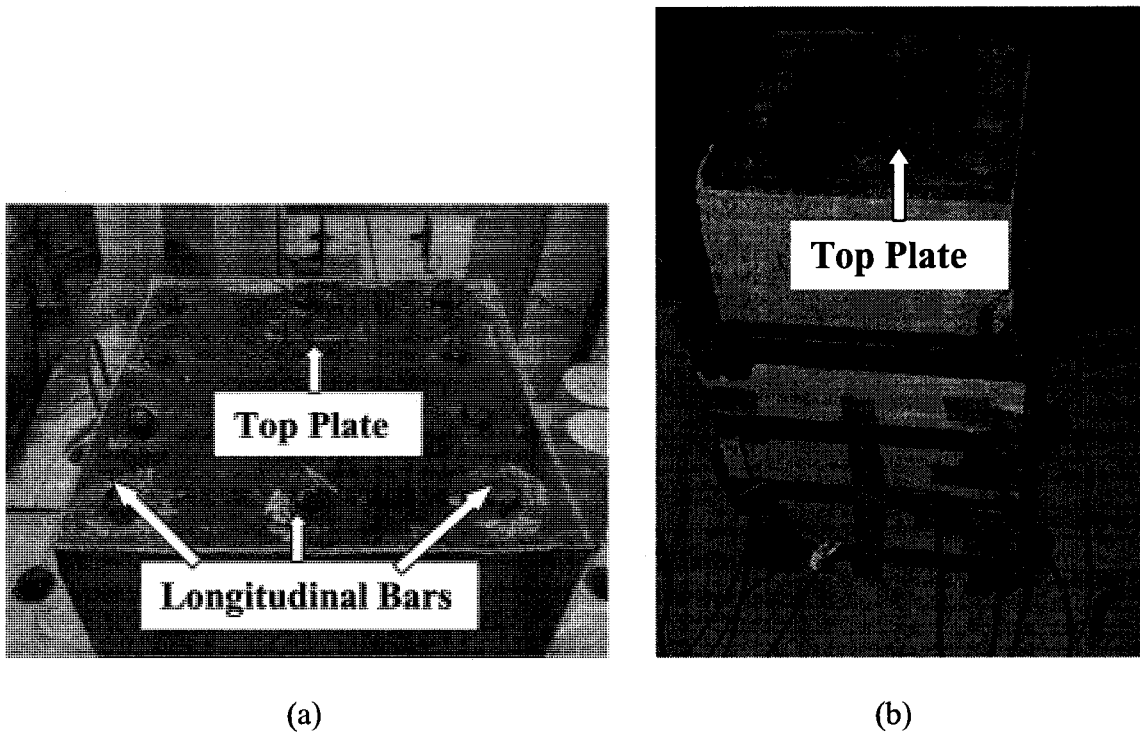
Welded top plate: (a) before welding; (b) after welding
